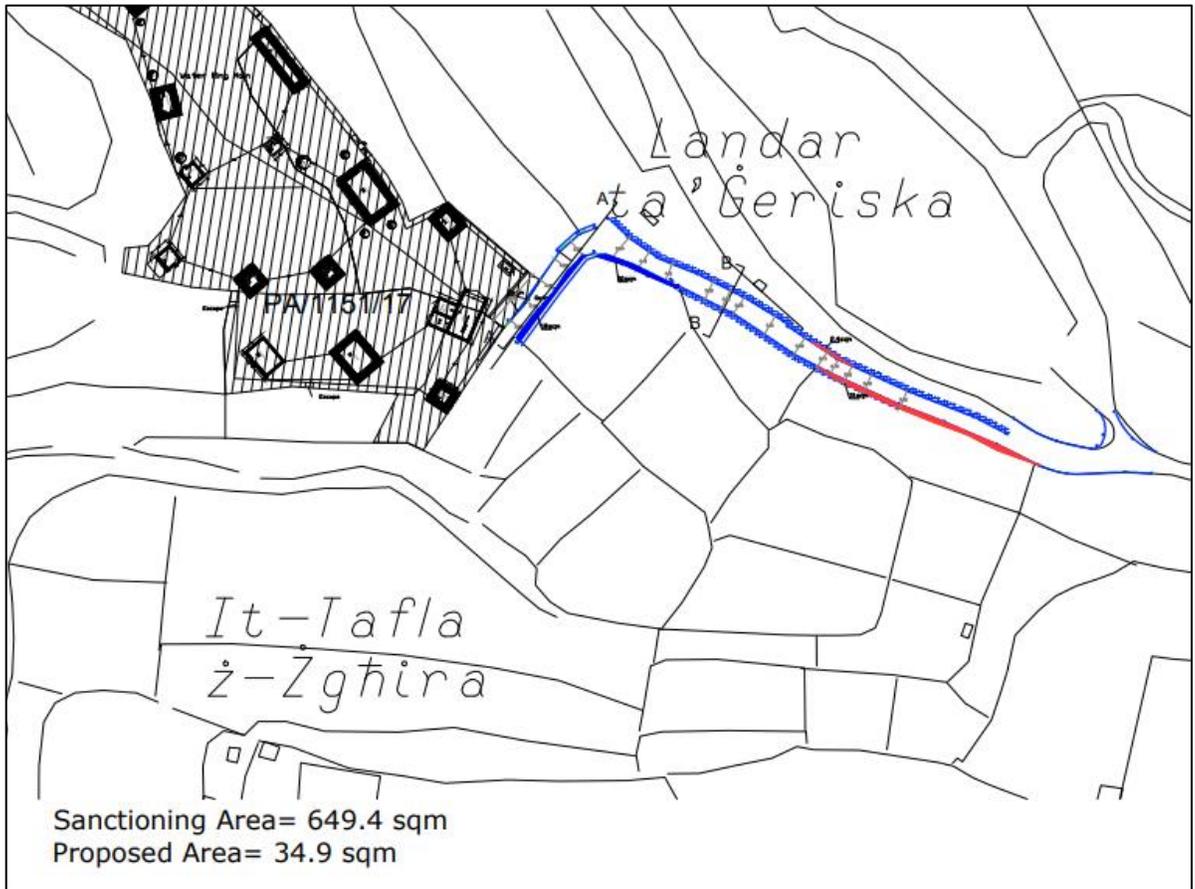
Area to be sanctioned (blue) and the proposed area to be widened (red).
